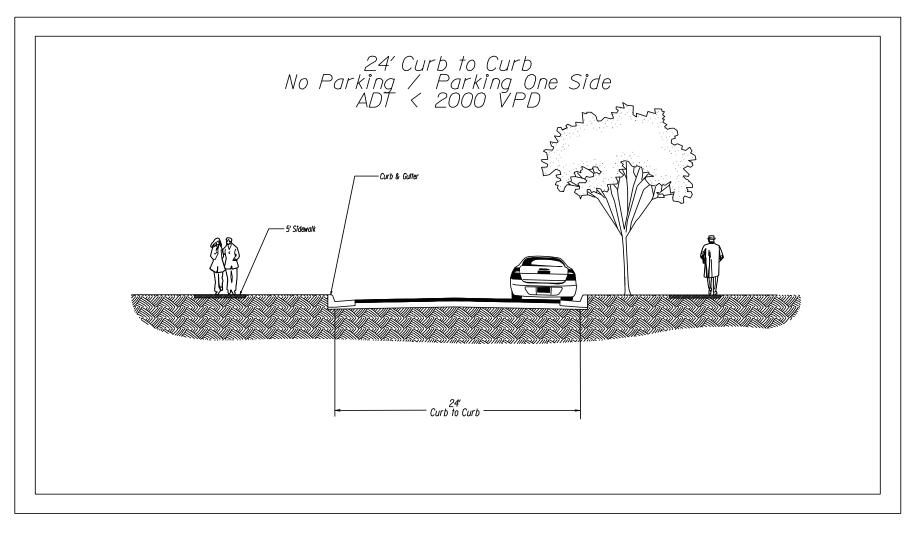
24' CURB TO CURB NO PARKING / PARKING ON ONE SIDE\
